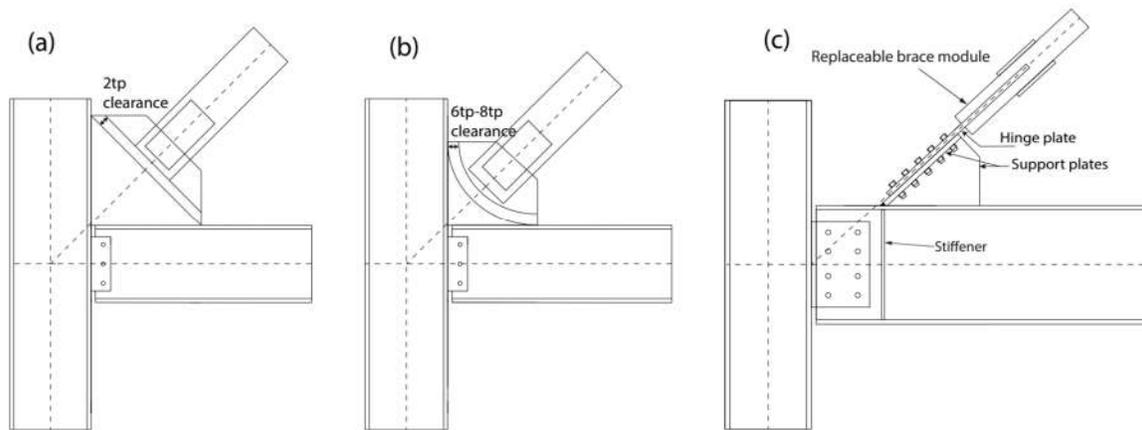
Brace to frame elements connection details: a) Typical gusset plate with linear hinge zone b) Typical gusset plate with elliptical hinge zone c) New proposed connection with replaceable brace module
